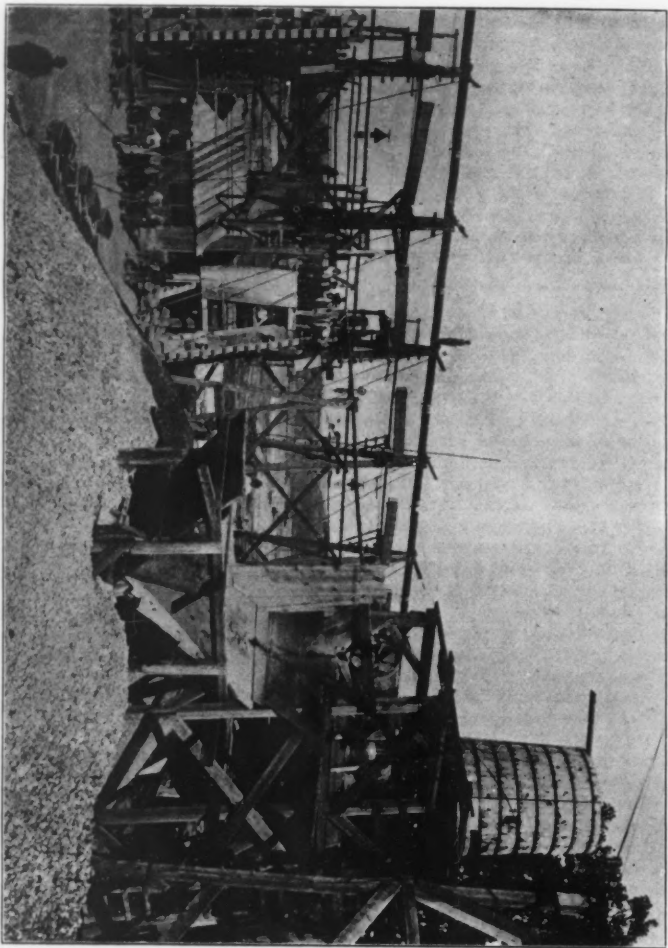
SCREENING APPARATUS, CONCRETE MIXERS AND TRESTLE FOR DISTRIBUTING PLANT.
